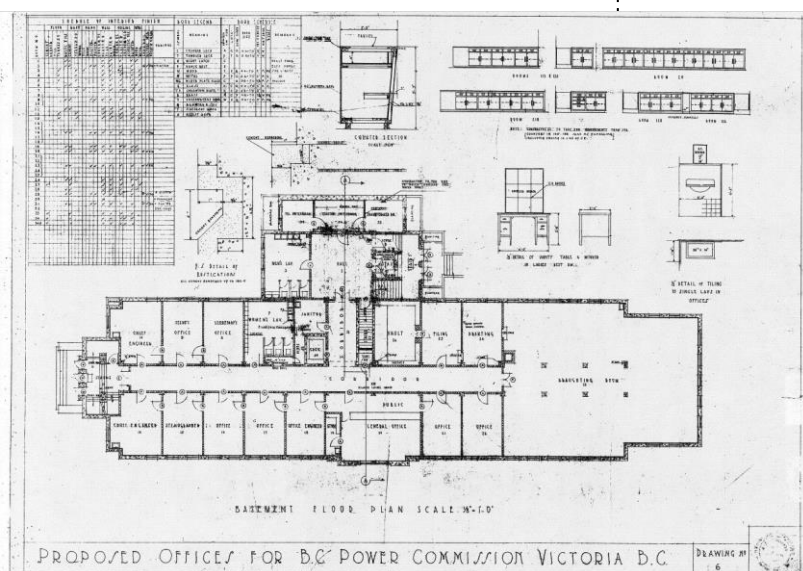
Basement Floor Plan (West Entrance) – Level 2
